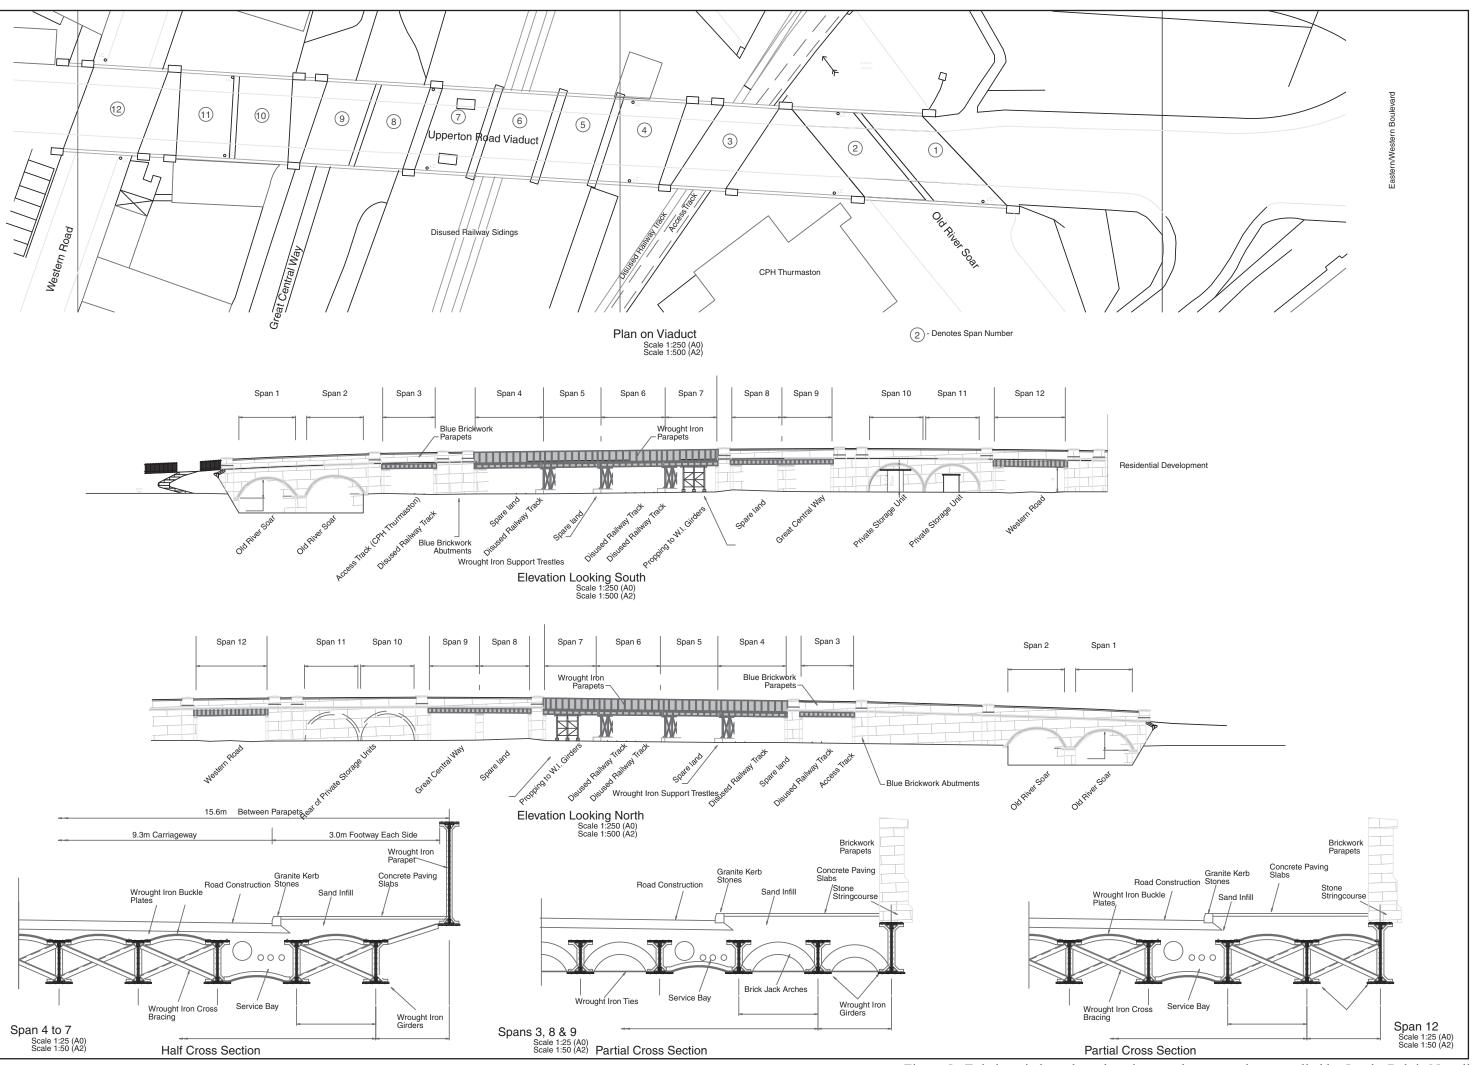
Existing viaduct plan, elevations, and cross sections supplied by Jacobs Babtie Nuttall
